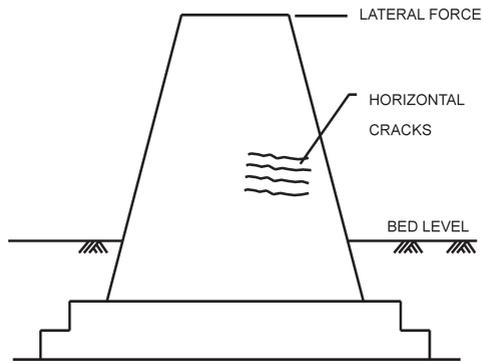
Horizontal cracks due to excessive lateral forces
